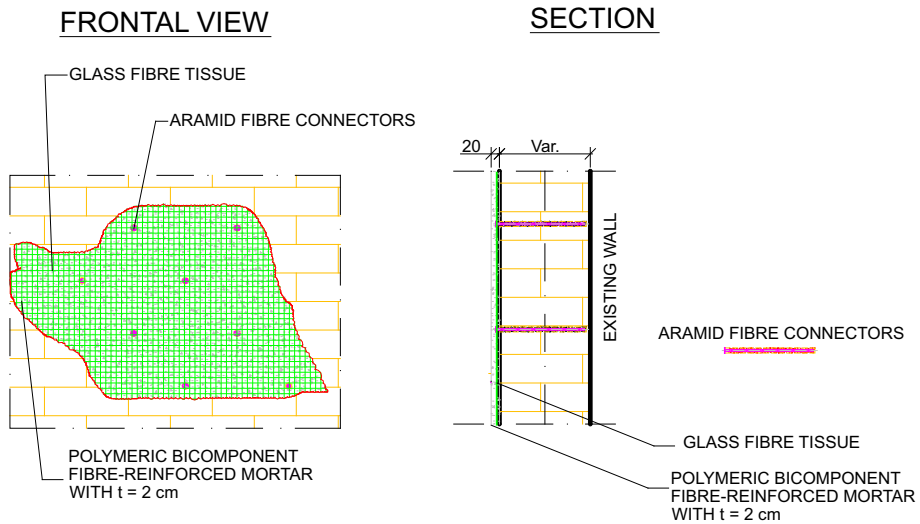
Reinforcement of masonry wall by glass fibre tissues.
